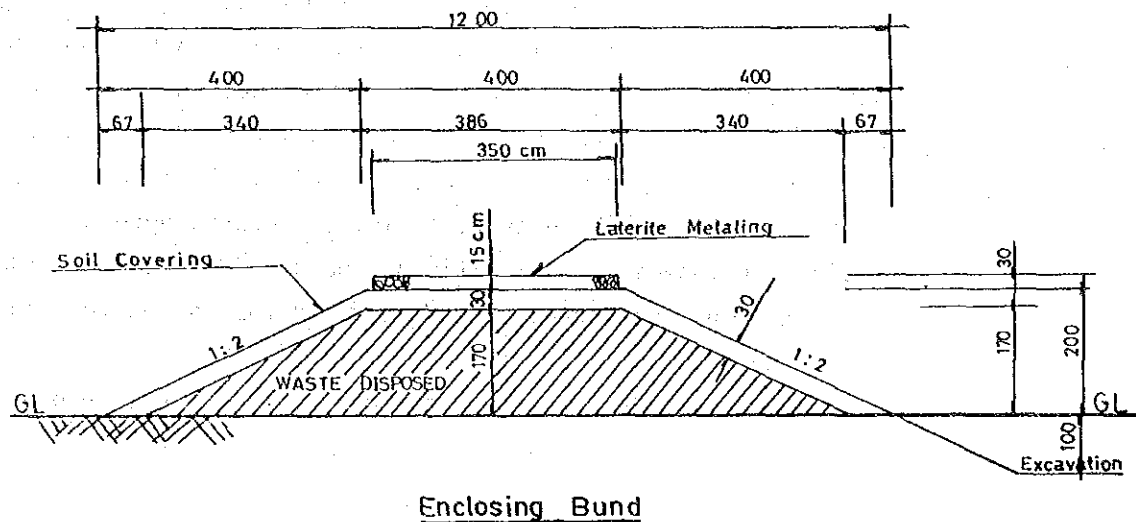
Site Development Plan for the Experiment on Sanitary Landfill
